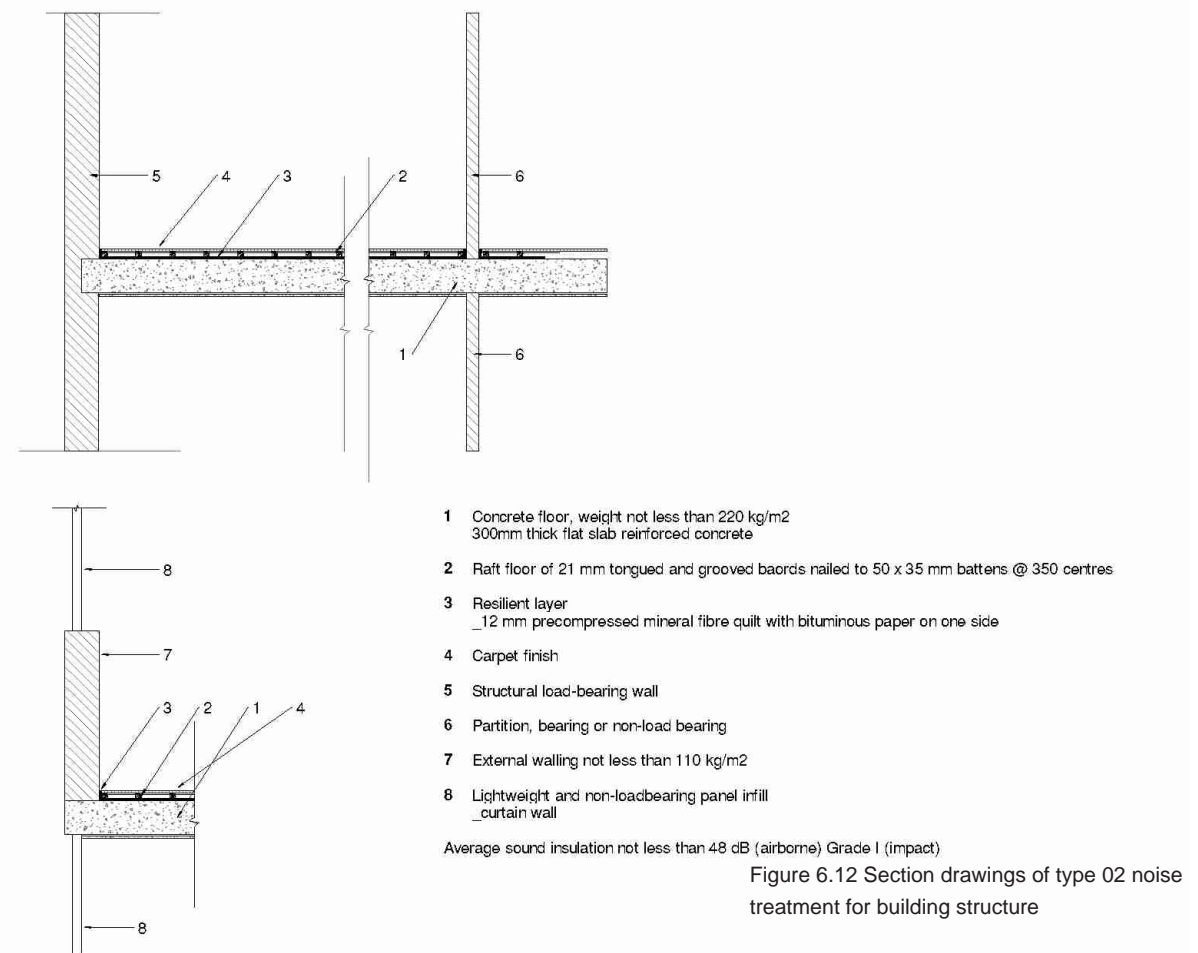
Section drawings of type O2 noise treatment for building structure
